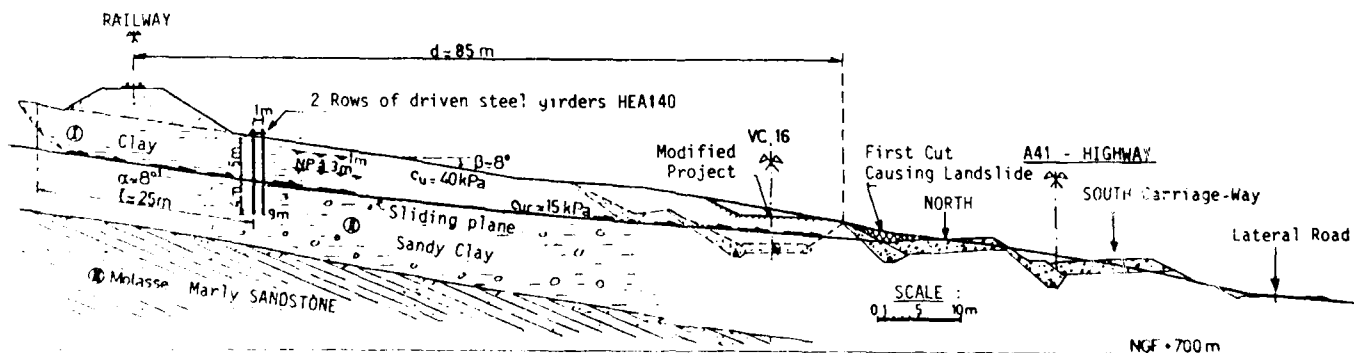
Soil Profile at "Les Houches" Zone with Highway and Soil nailing Project
